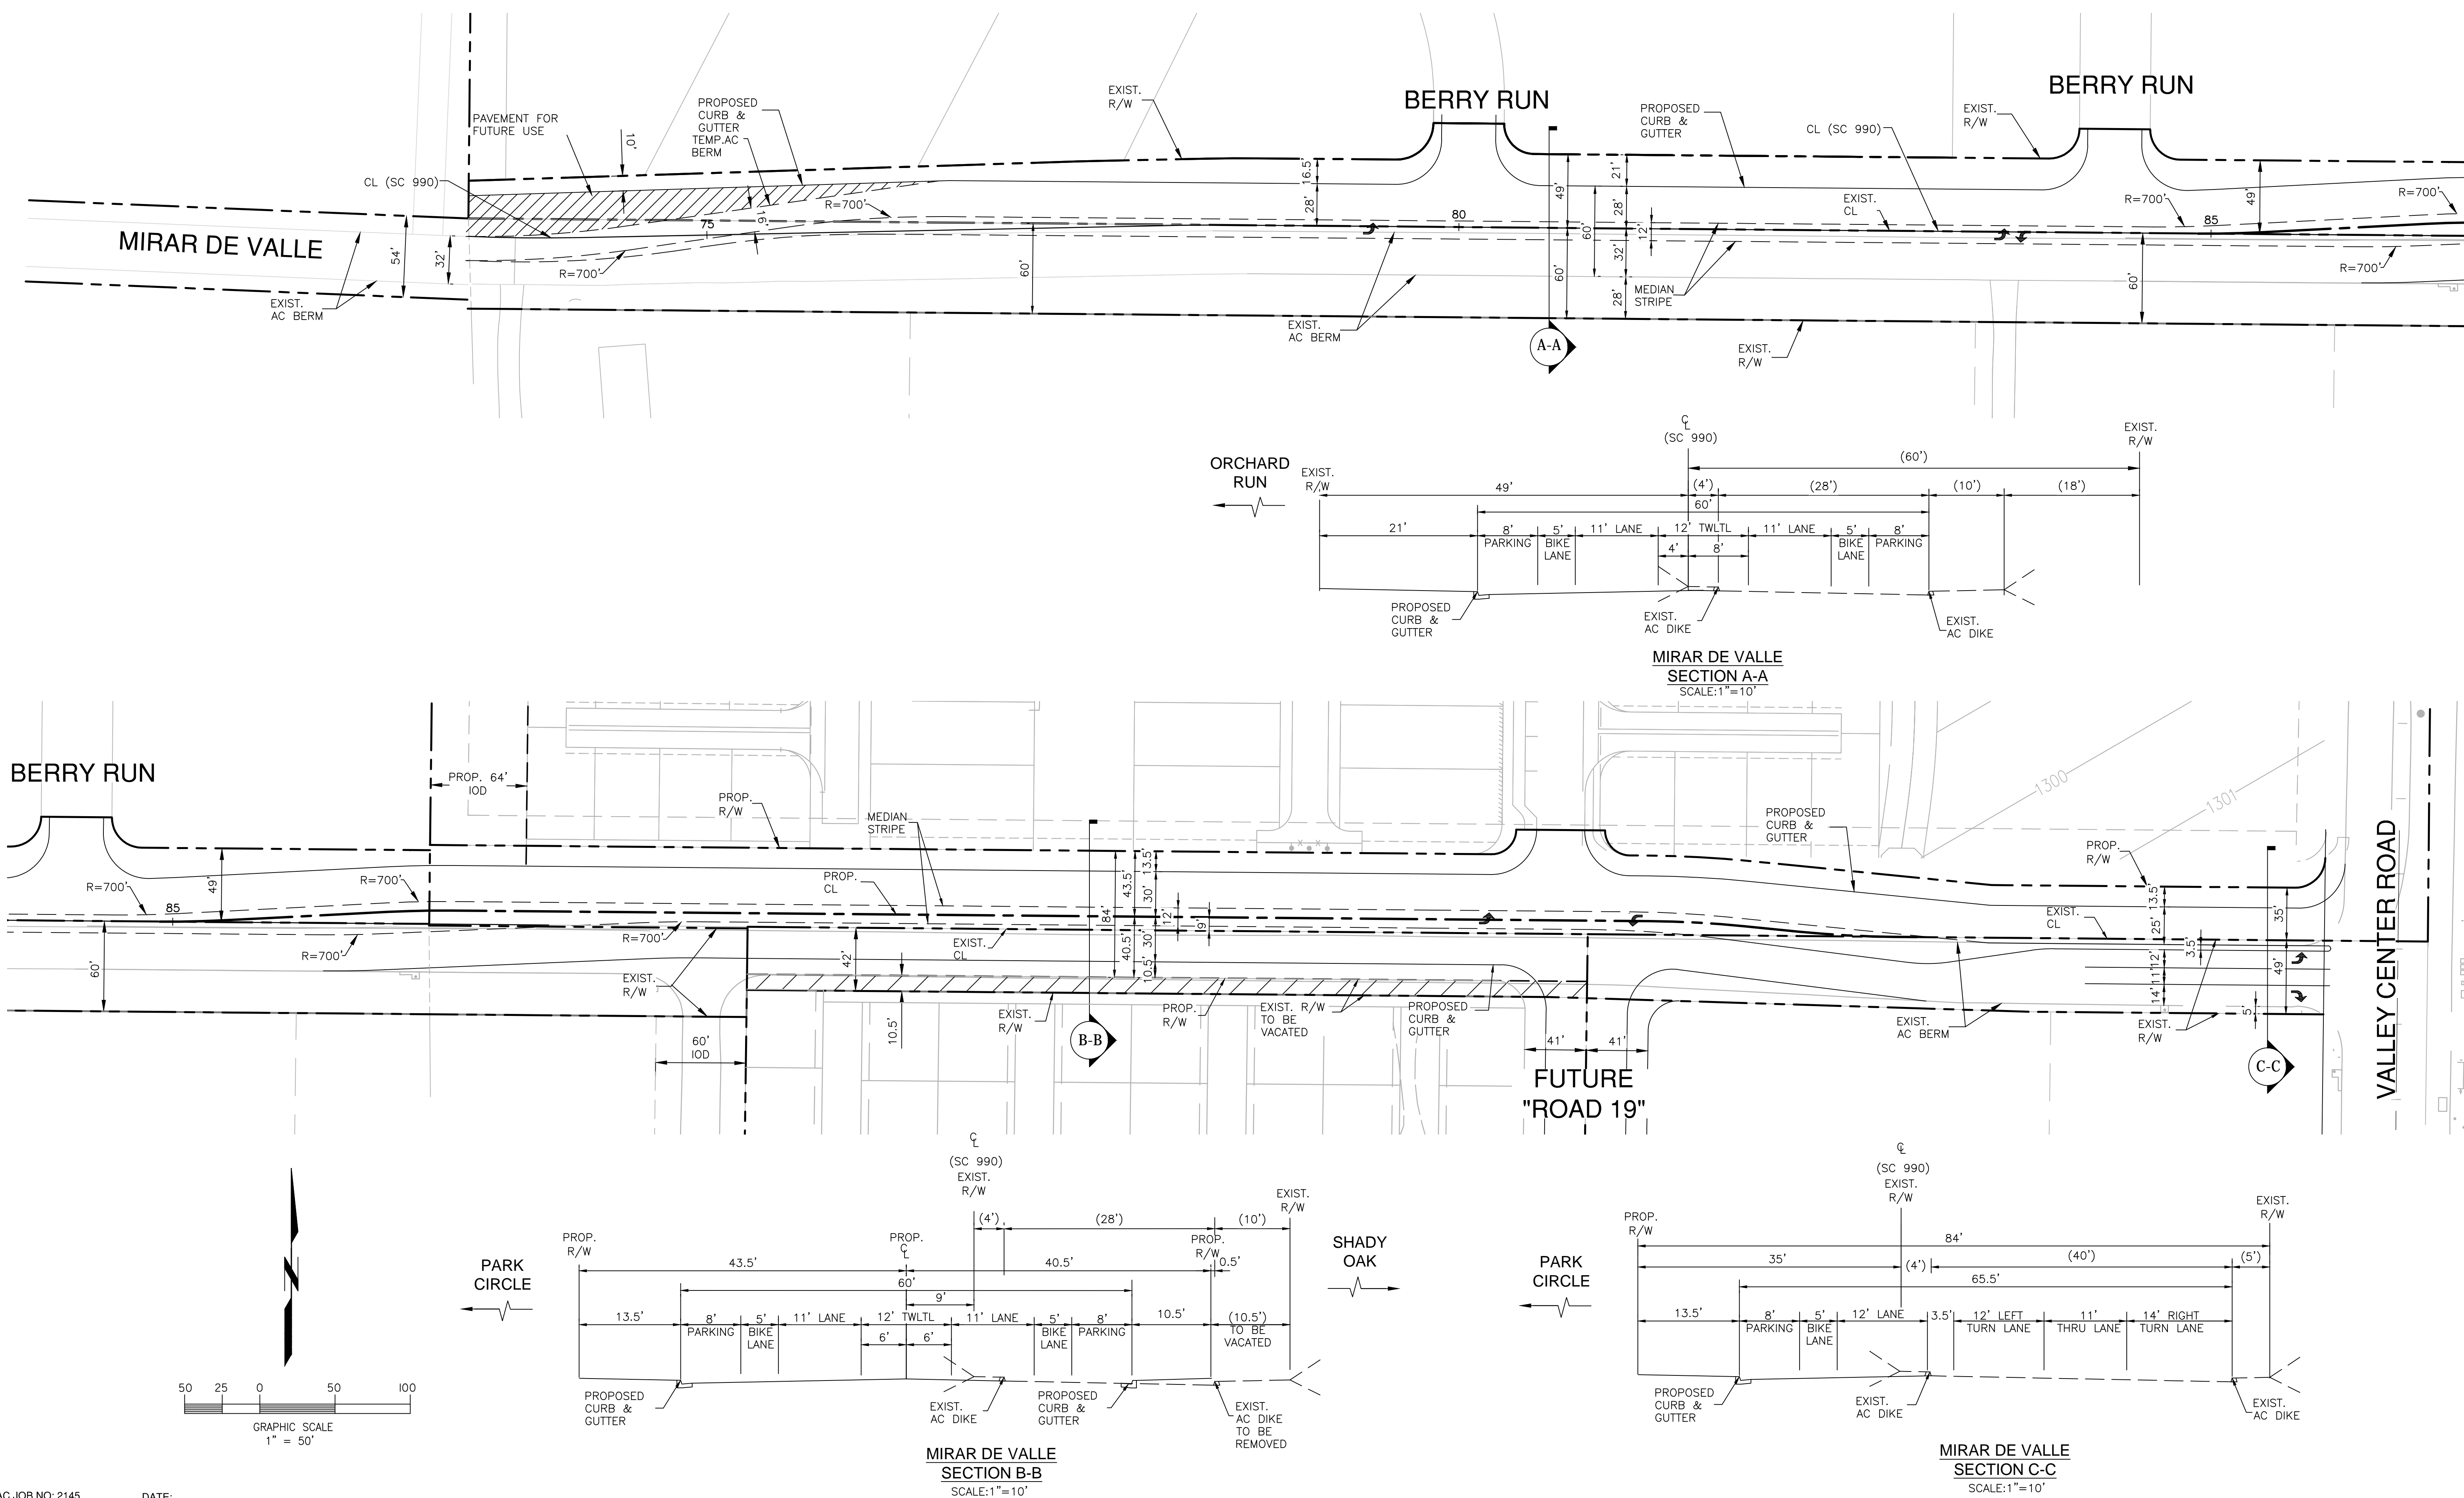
MIRAR DE VALLE STRIPING PLAN
